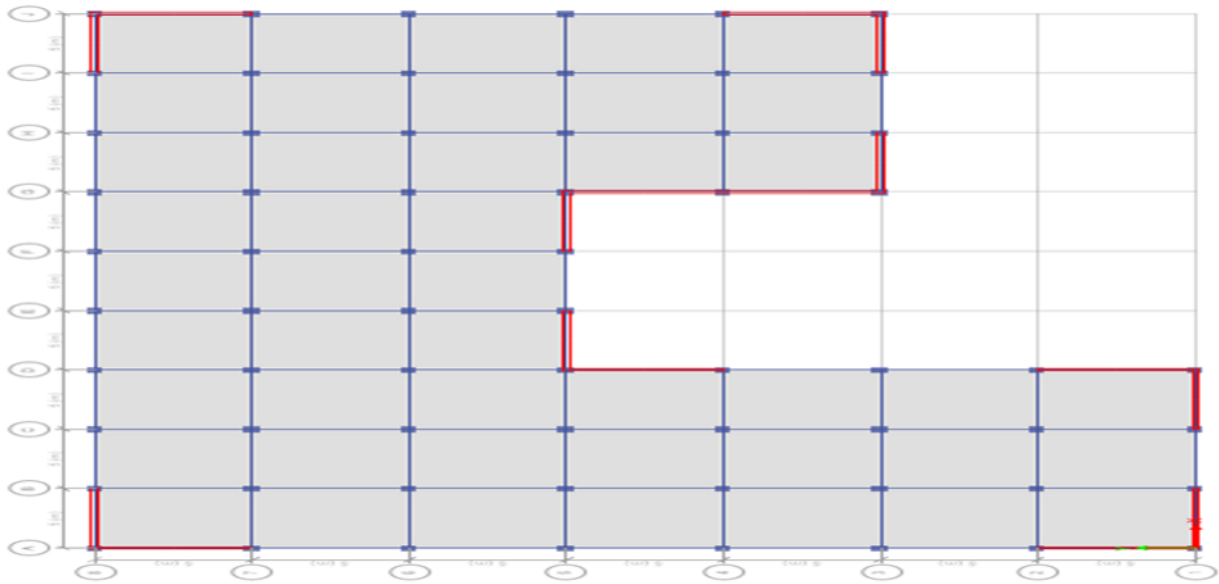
Plan view of C- Unsymmetrical type with Shear wall at Corners with blast loading
